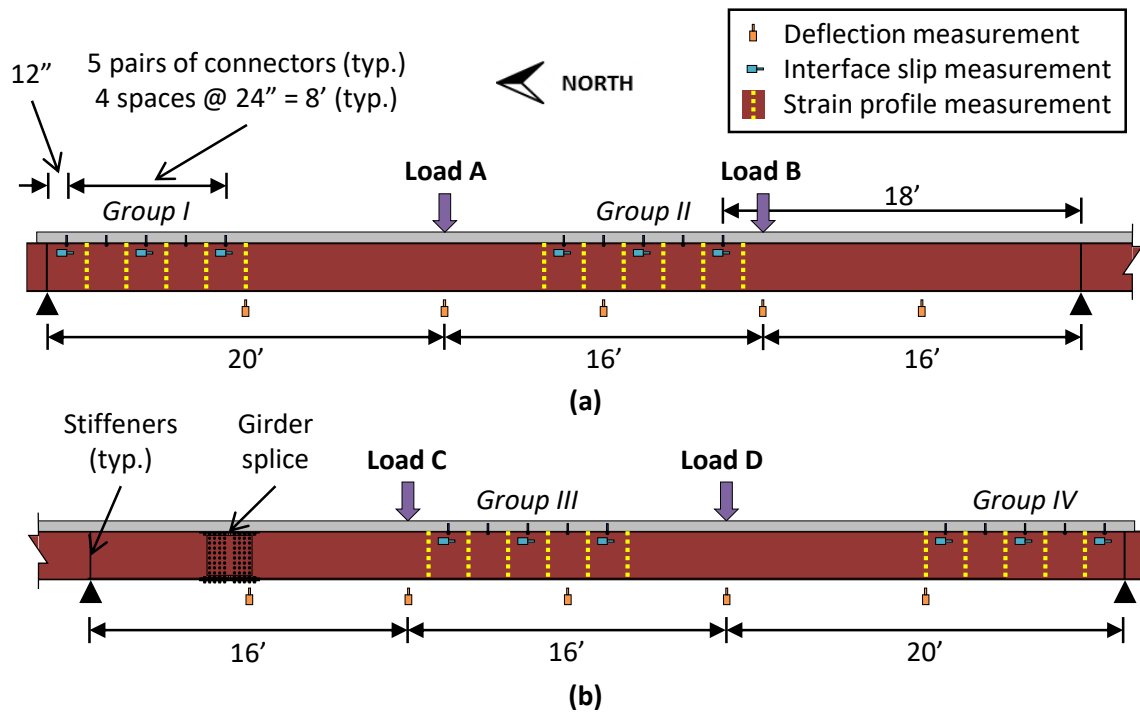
Elevation View of Second Specimen – (a) North Span and (b) South Span
